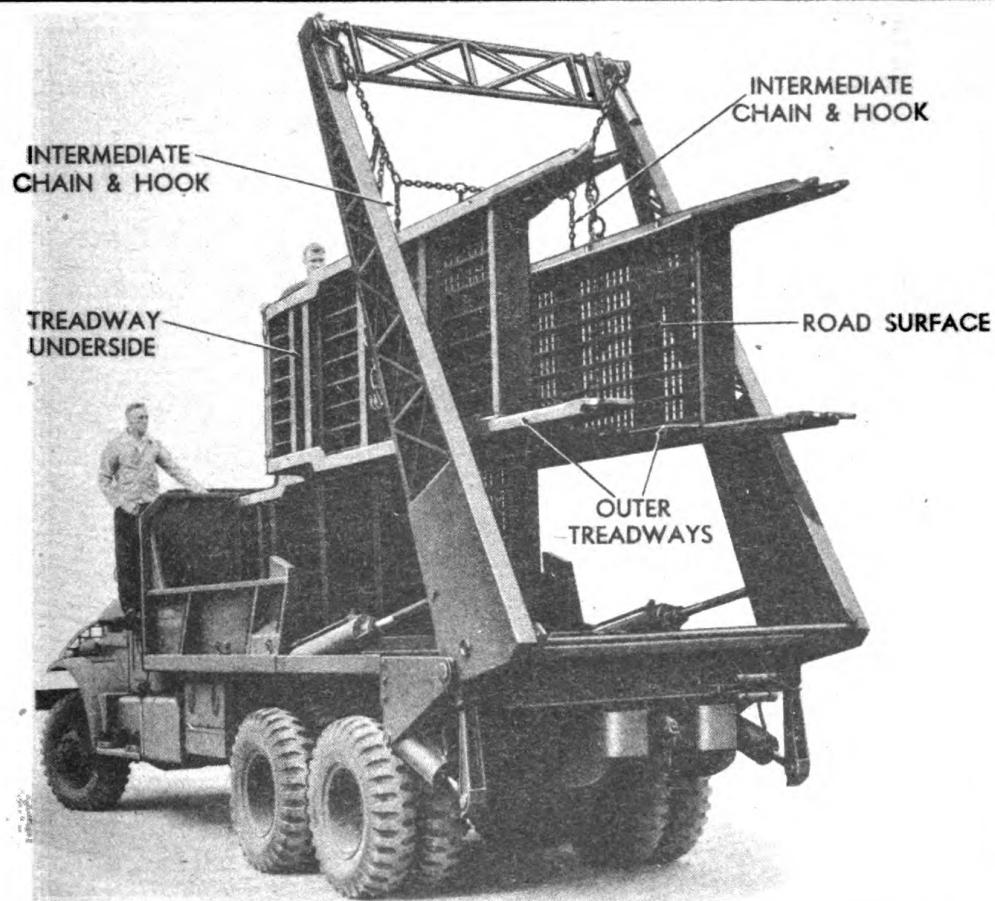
Hydraulic Bridge Erecting Crane in Operation
